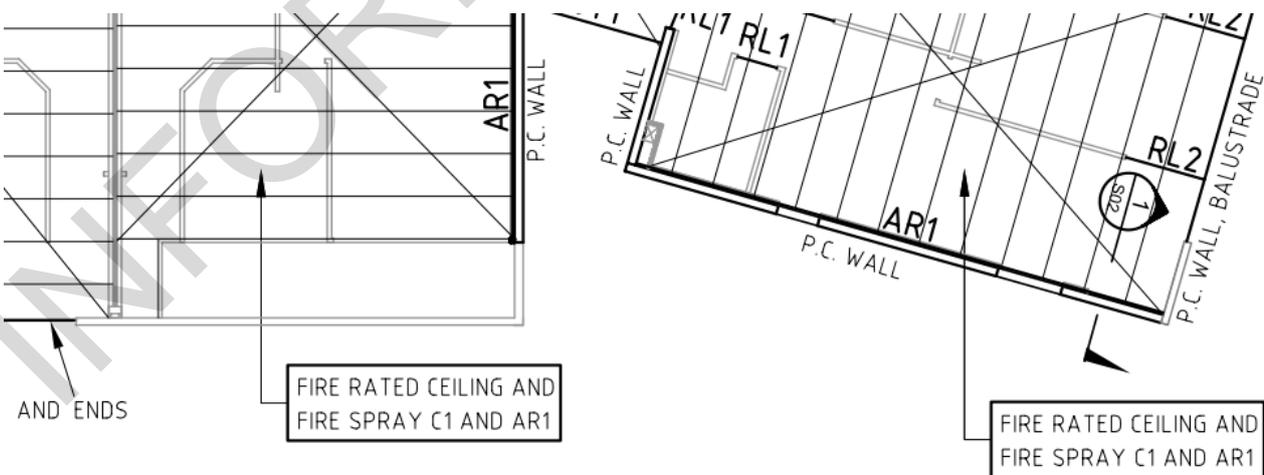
Extract from Building Permit Stamped Structural Drawings
